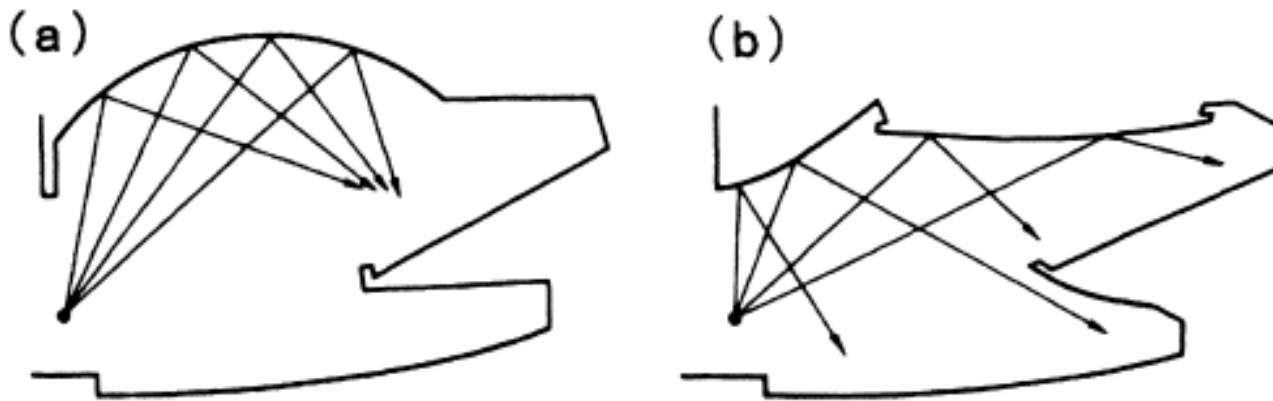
Longitudinal sections of auditoria: (a) poor ceiling; and (b) good ceiling.
